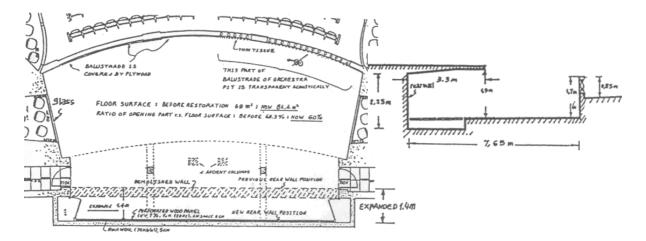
Plan and cross section of the extension of the pit after the renovation in [3]
